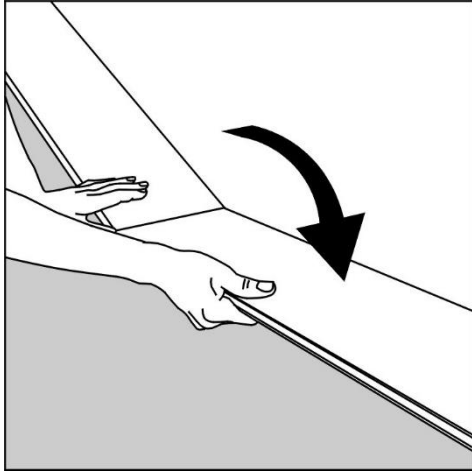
Hold the second plank short end tongue against the first plank short end groove at an angle to engage and press the short ends together. Lay the connected planks flat on the floor. Complete the first row by connecting more planks in the same manner.
